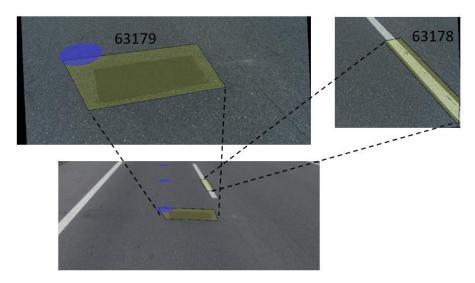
Sample view of damage types in the low-resolution panoramic camera (bottom) and the high res pavement cameras (top).
